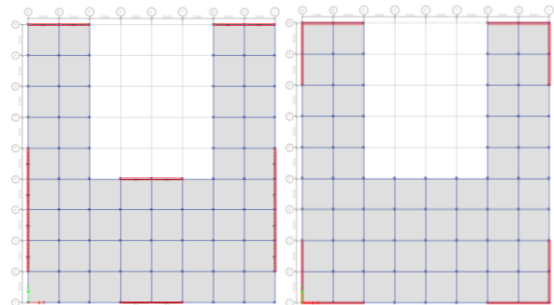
Shear wall at location 1 Fig- 2 Shear wall at location 2
